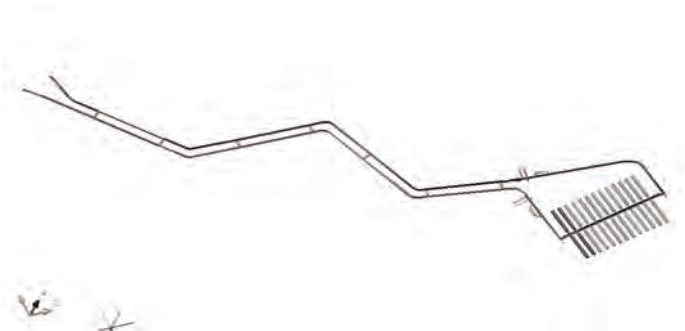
Basic layout of the planned excavation with two inclined access tunnels and an underground research laboratory.
